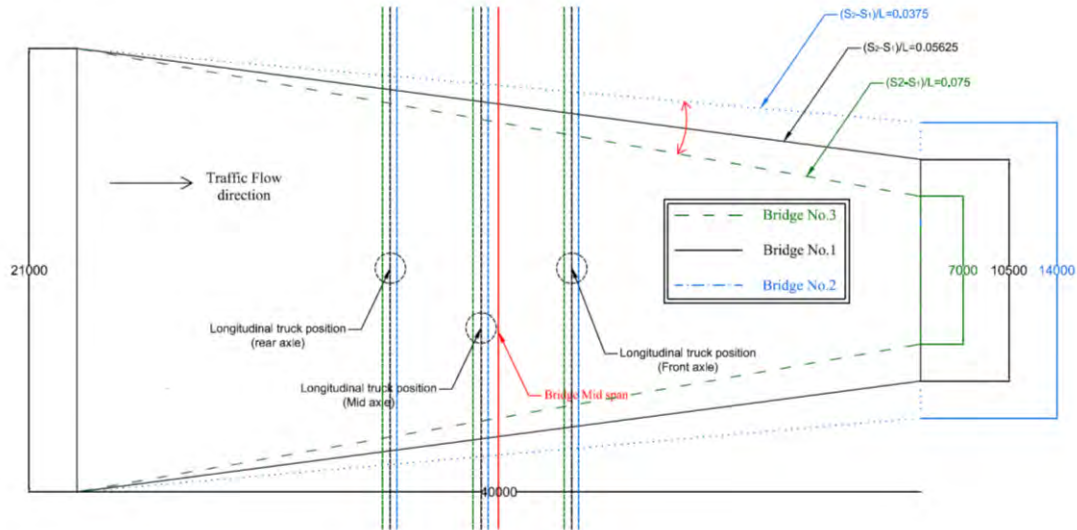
Bridges B1, B2, and B3 plan view - flexure
